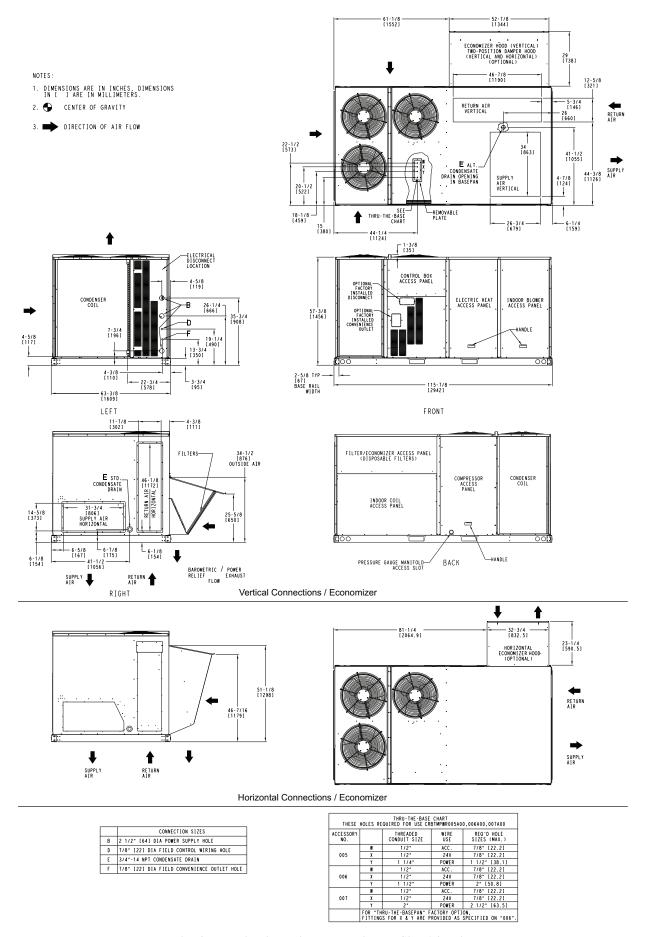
Unit Dimensional Drawing — Size 16 Unit
